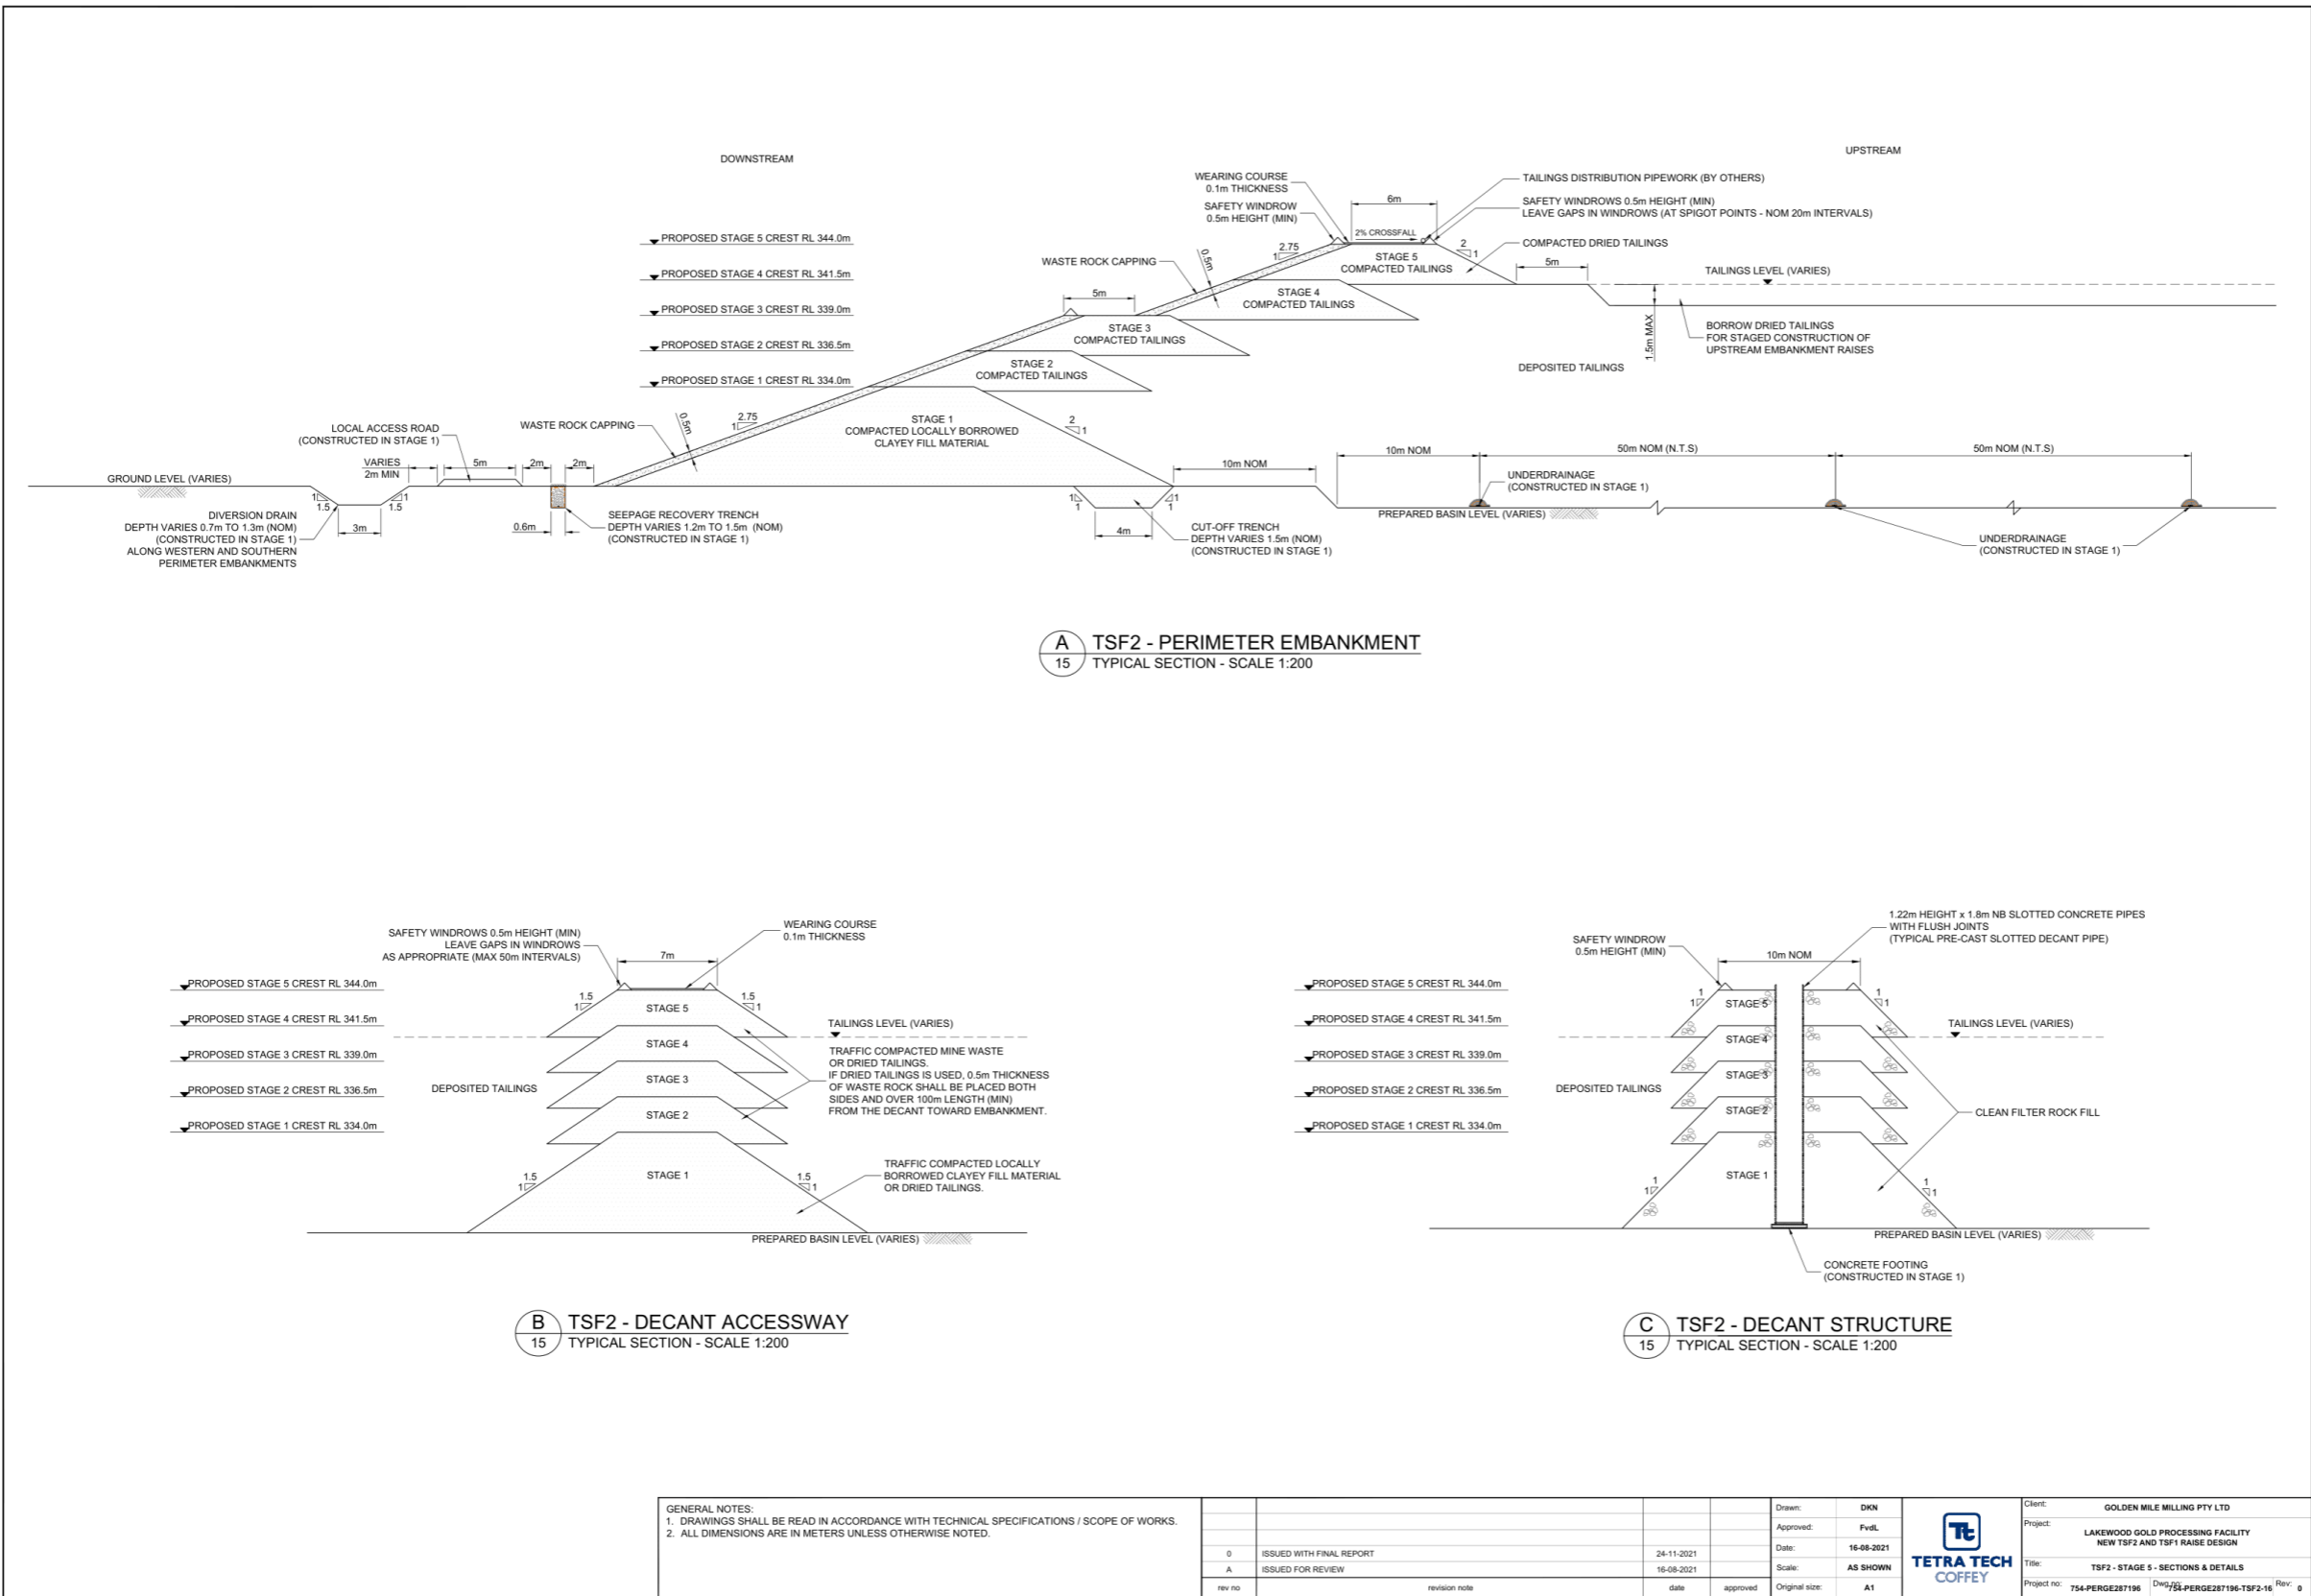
TSF2 – Stage 2 to 3 construction drawings
